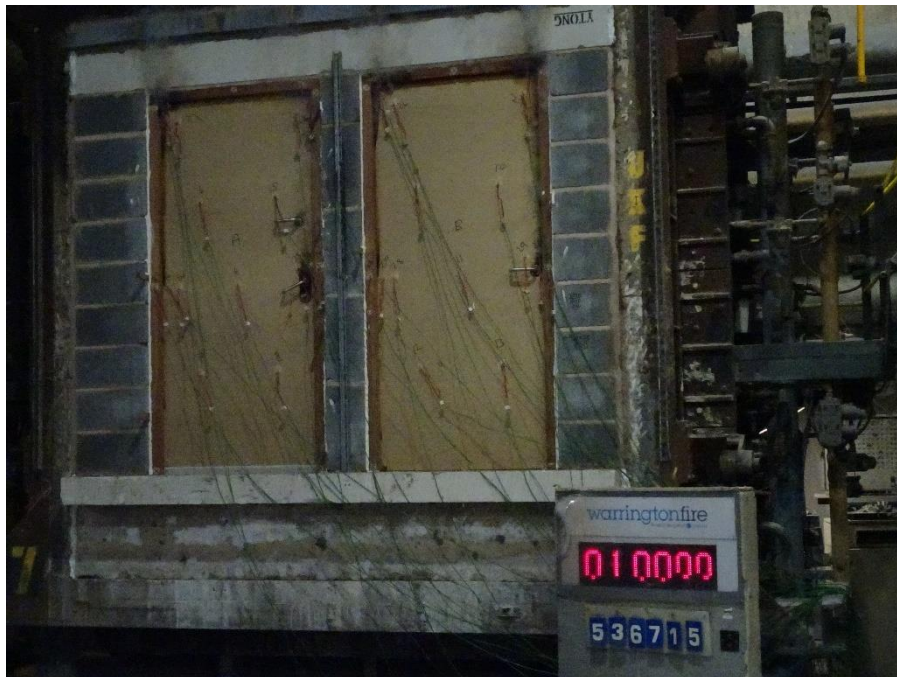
Unexposed face of the specimen at 60 minutes of testing
